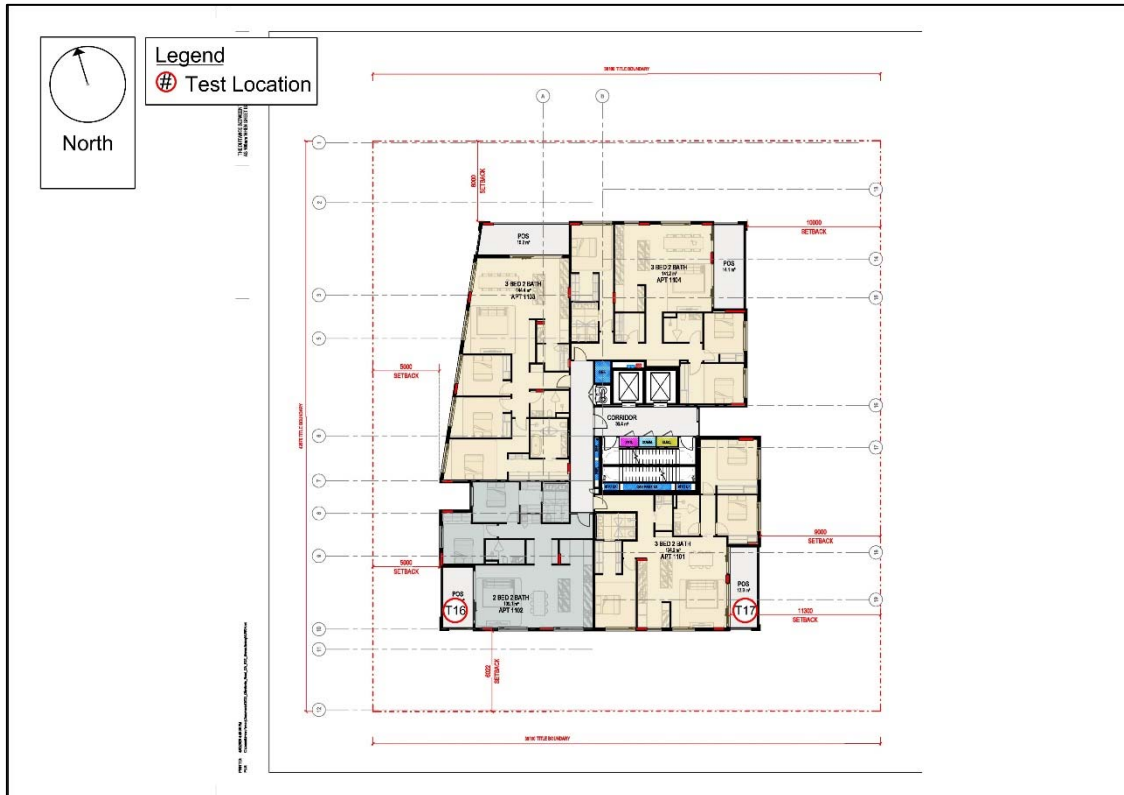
Test Locations on Level 13 of proposed 846-858 Glenferrie Road development.
